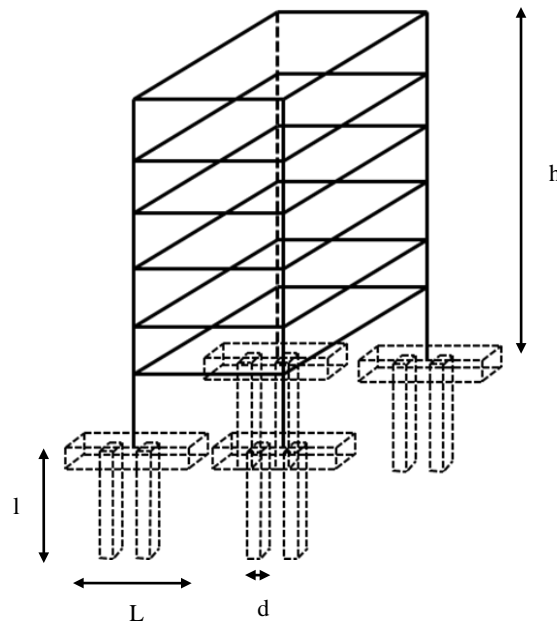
Schematic diagram showing the Pile supported Frame Structure
